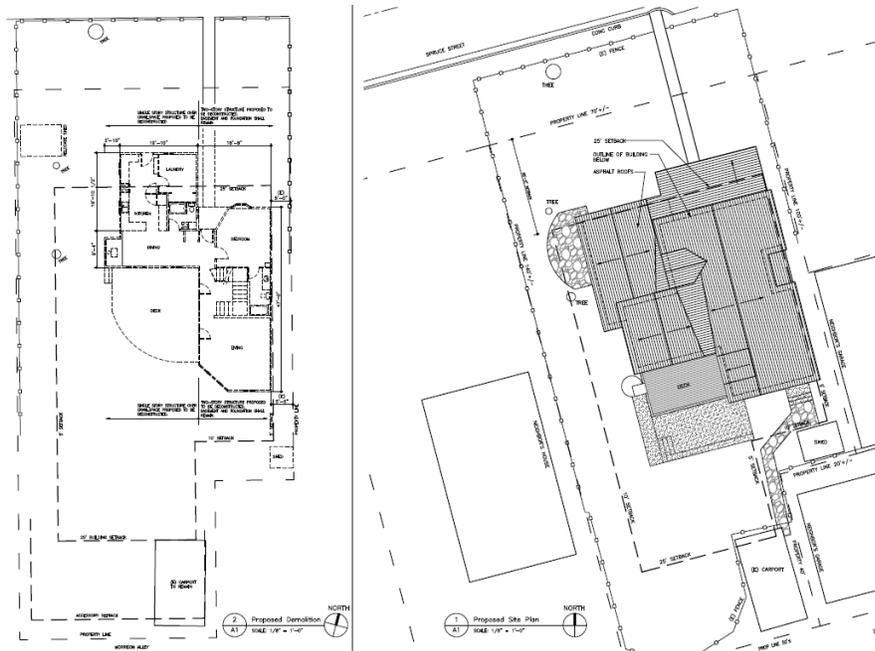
Existing (l) and proposed (r) site plans, 420 Spruce Street
